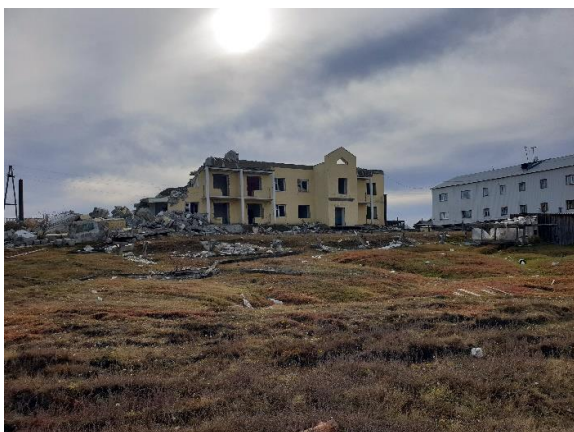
Remains of the “Experimental house” built without a pile foundation, Amga, September 2021. Photo by A.A. Suleymanov.
